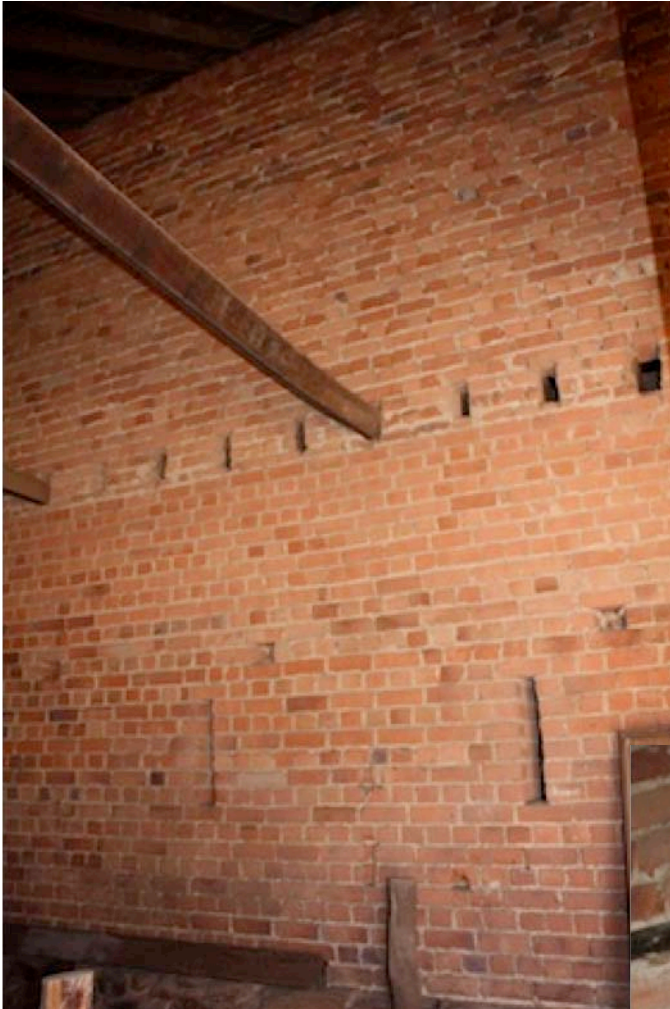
Western wall of two storey section from the single storey side. Note joist holes and vertical vents.
